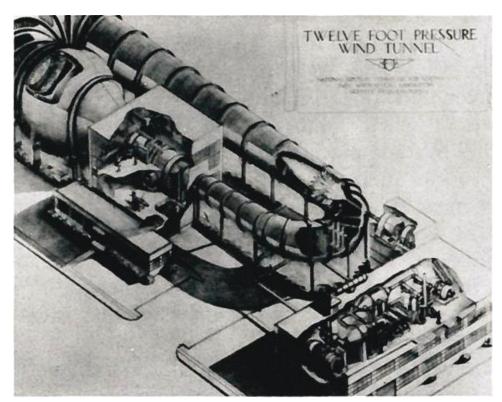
Cutaway drawing, Building N206A at bottom right. (Source: Hartman 1970)
